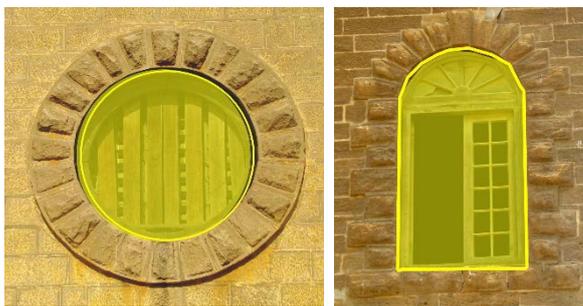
Termite Infestation - Fenestration, Windows and Doors, South-east Elevation, Tower, Barrack A, B, C and D, 15 to 17 A, East Wharf, KPT, Karachi
